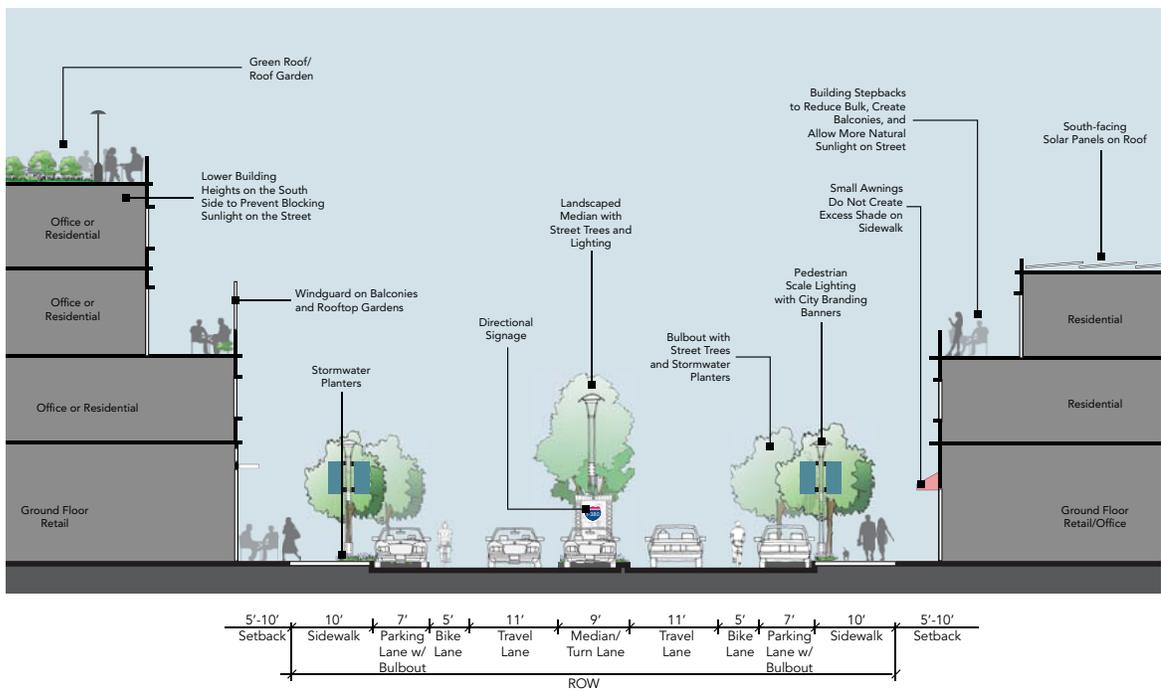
Proposed Improvements (San Bruno Avenue facing East between El Camino Real and Huntington Avenue)
